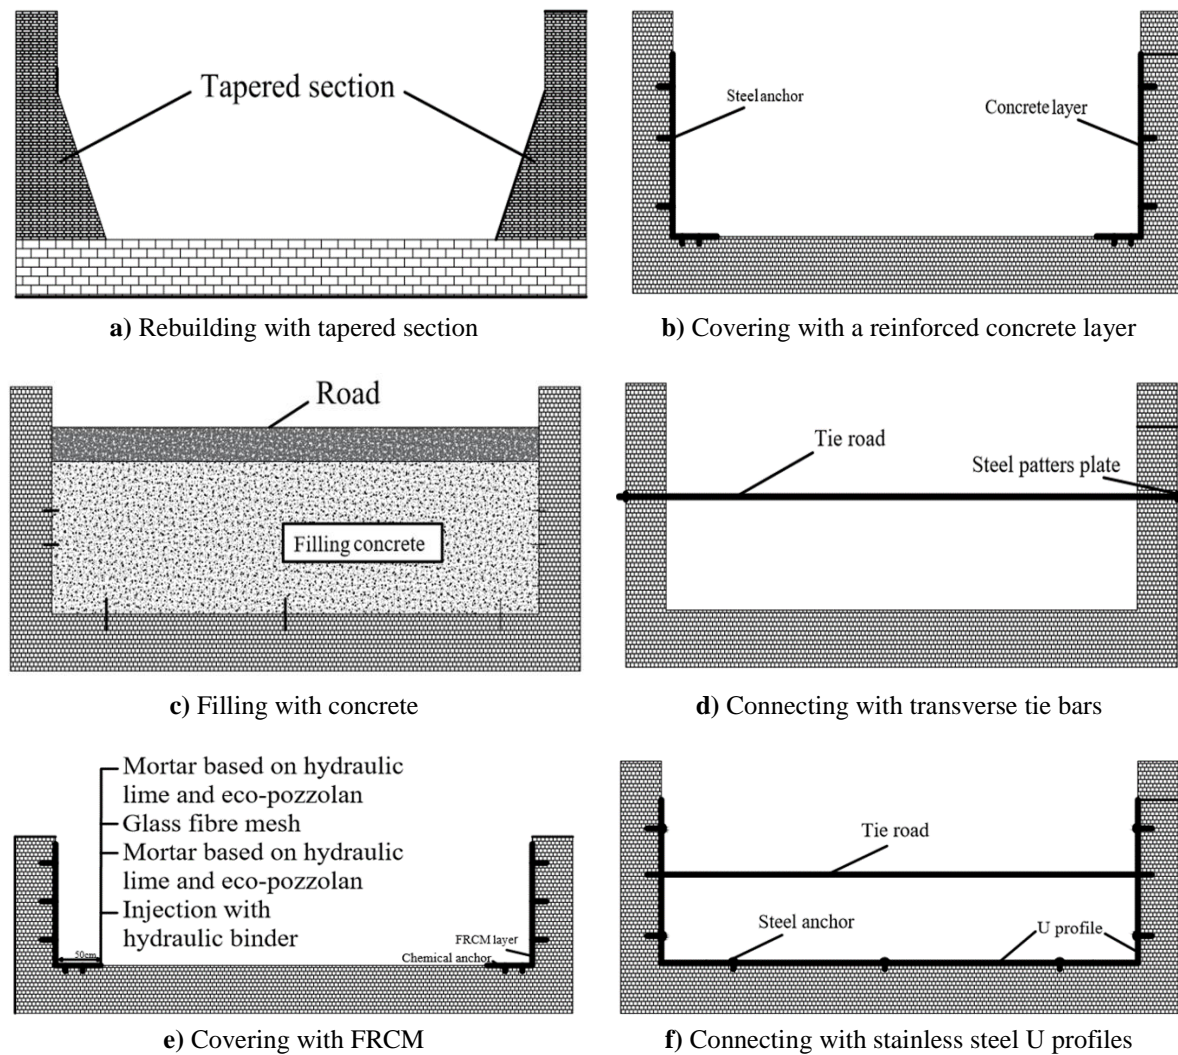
Strengthening techniques for spandrel walls of masonry bridges (Bayraktar and Hökelekli, 2021)
